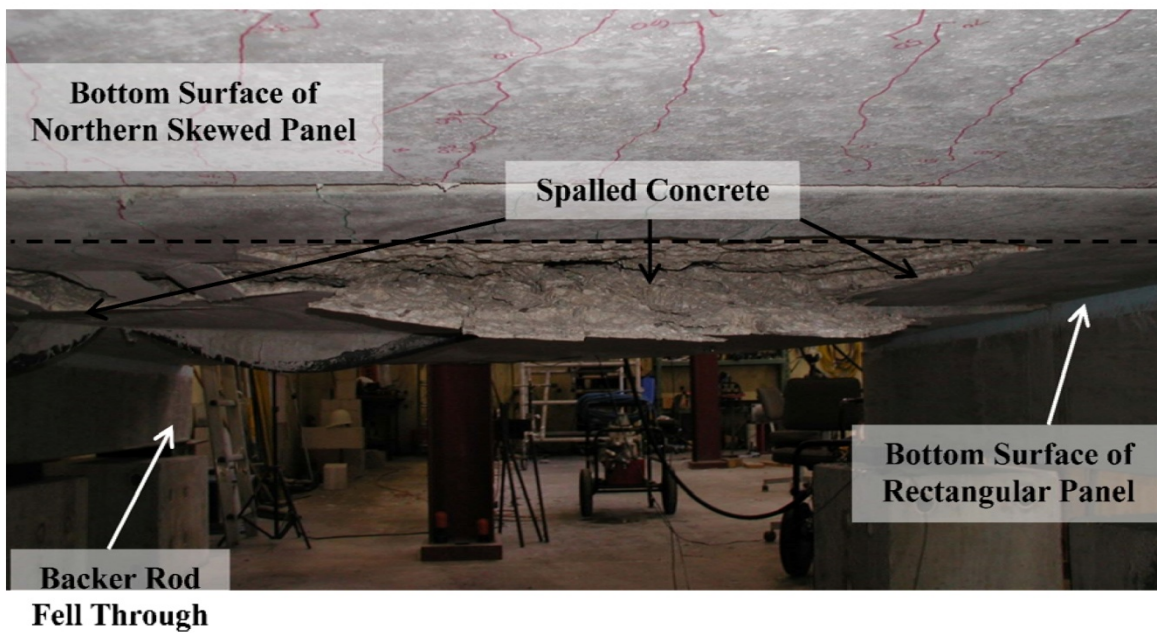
Photograph of Spalled Concrete at Conclusion of Test of Specimen 10A for Load Applied at Midspan of Square End
